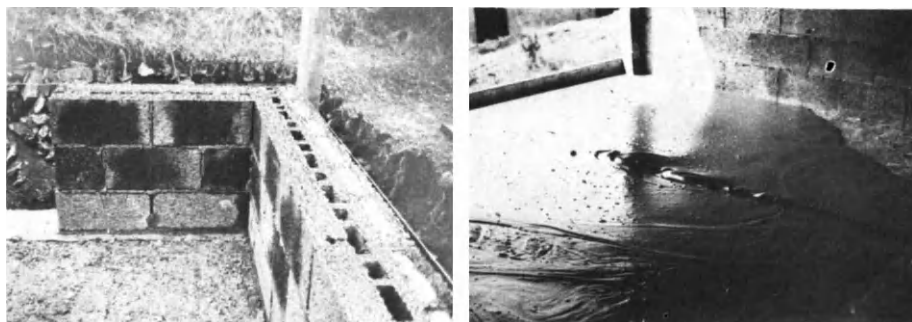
Insulation techniques used in the outer walls (insulating blocks with polystyrene) and ground floors (foam cement).
